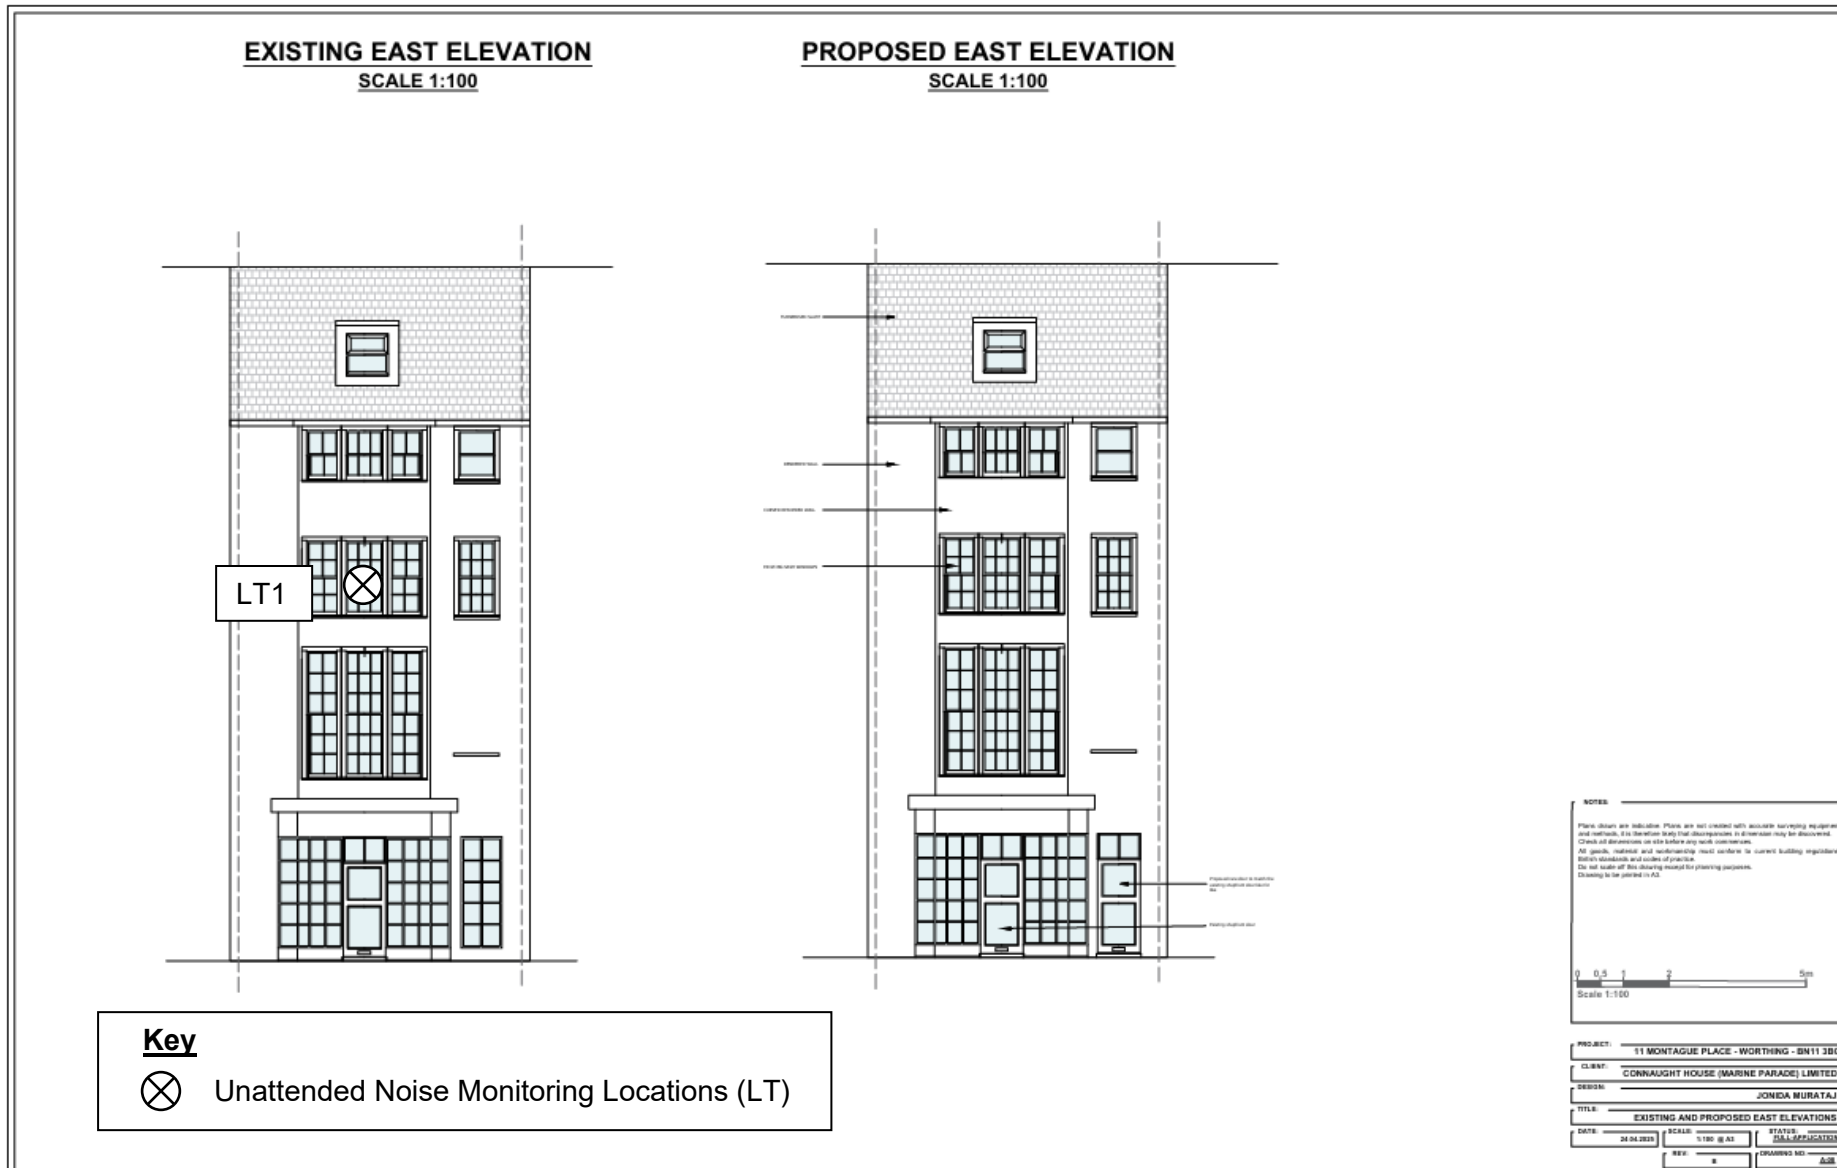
Existing and Proposed Front Elevations and Unattended Noise Monitoring Location LT1
